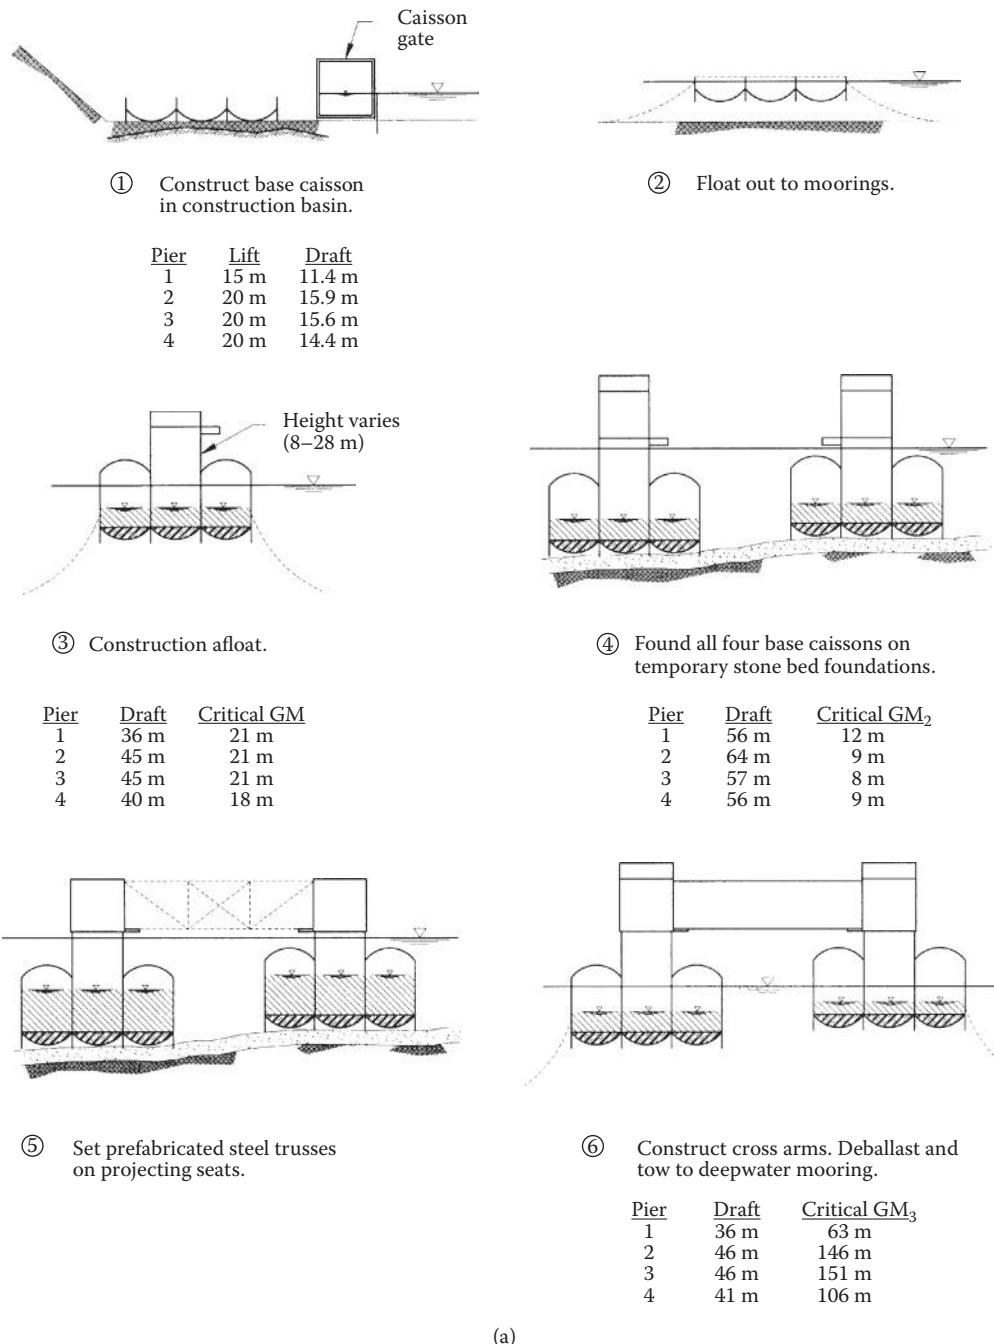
Fabrication and installation concept for piers in 300 m water depth for crossing the Strait of Gibraltar.
